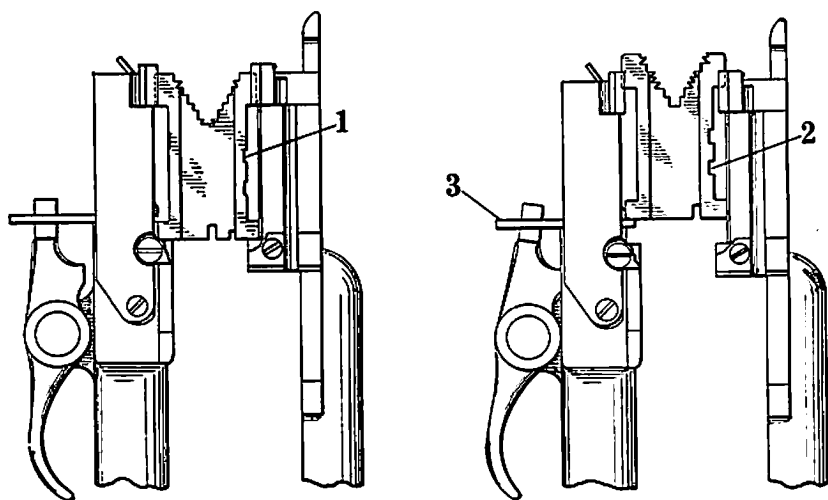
End View of the Assembling Elevator, showing how matrices are assembled in upper and lower positions to cast different faces of type from one of the two matrix cells.
